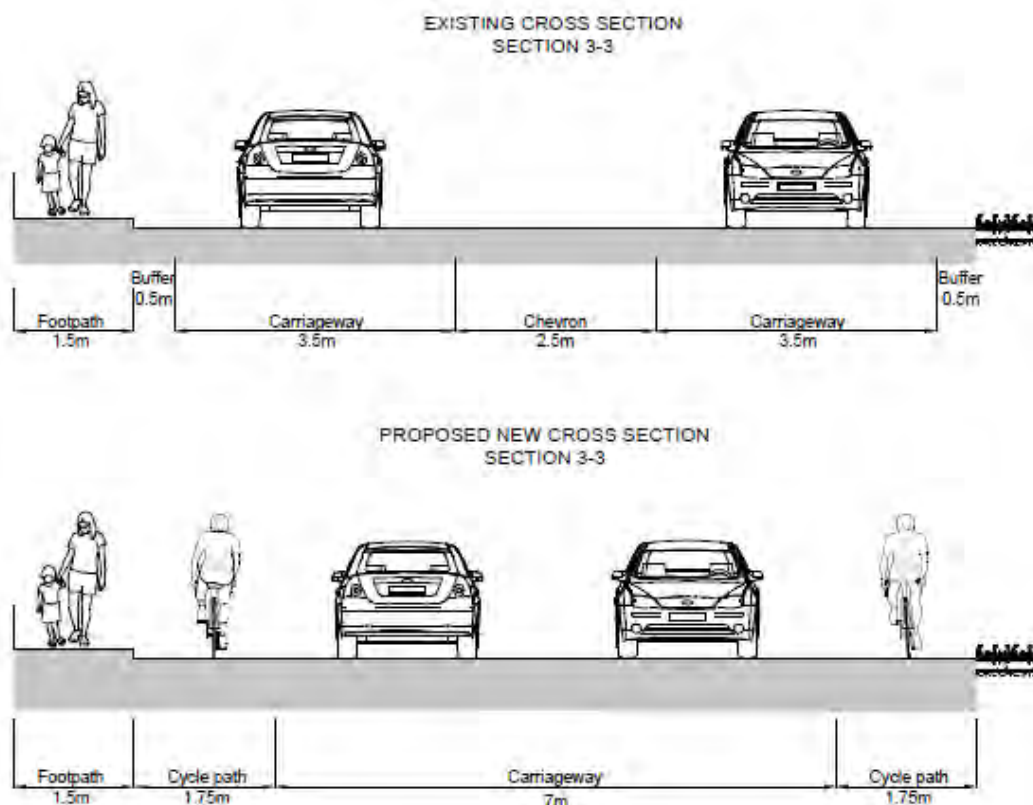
N71 Glasslynn Rd Typical Cross Section
